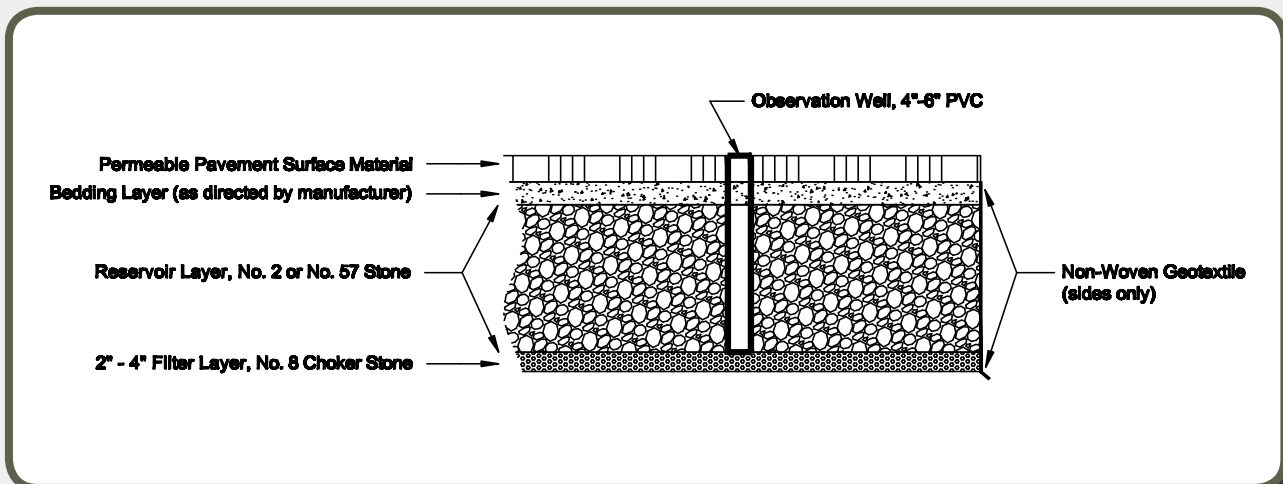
Cross Section of Level 2 Permeable Pavement Infiltration Design
